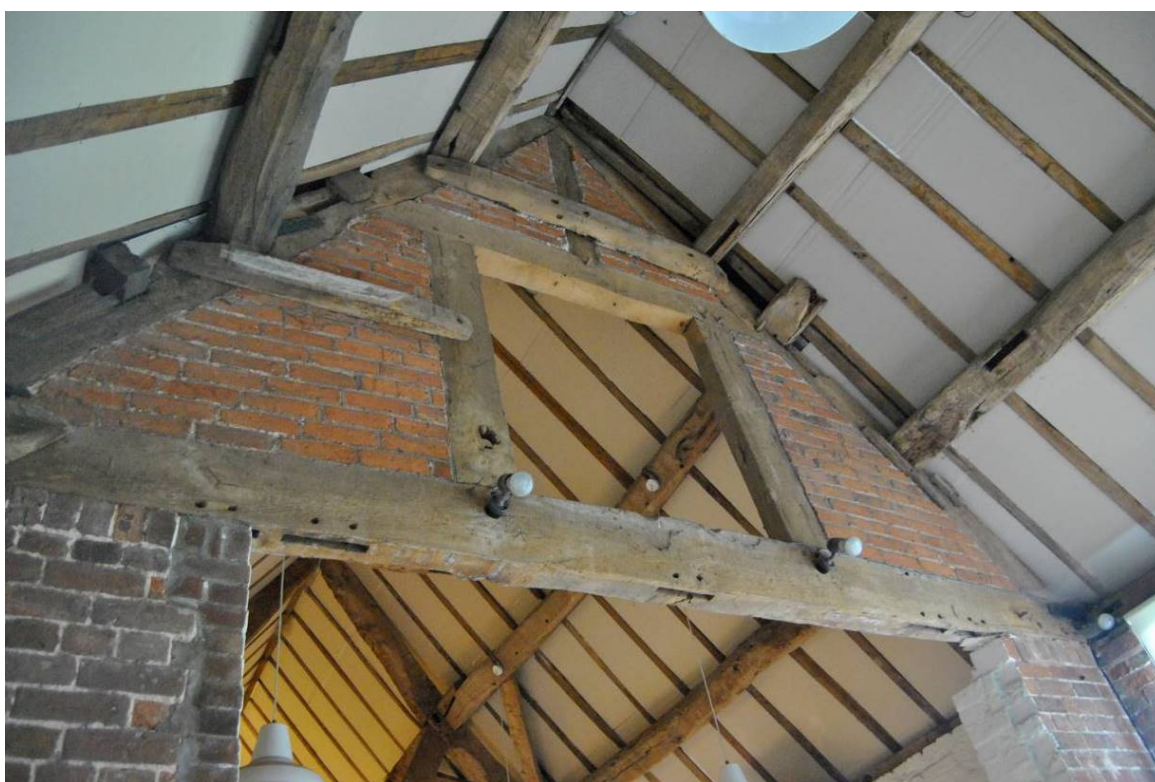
Truss T3 to south side of threshing bay (NB. pegging and empty mortices to soffit).
